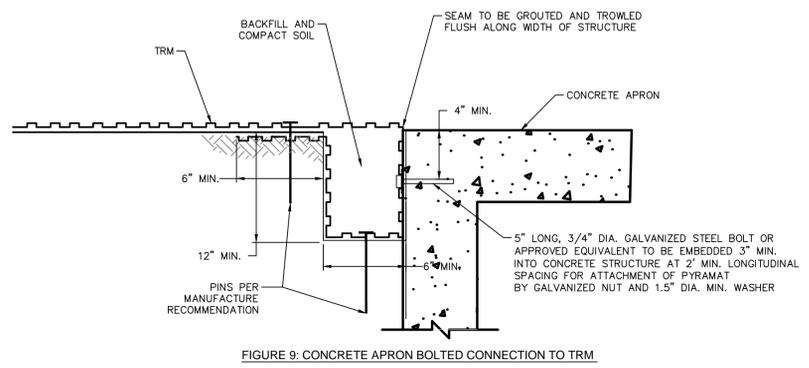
CONCRETE APRON BOLTED CONNECTION TO TRM
